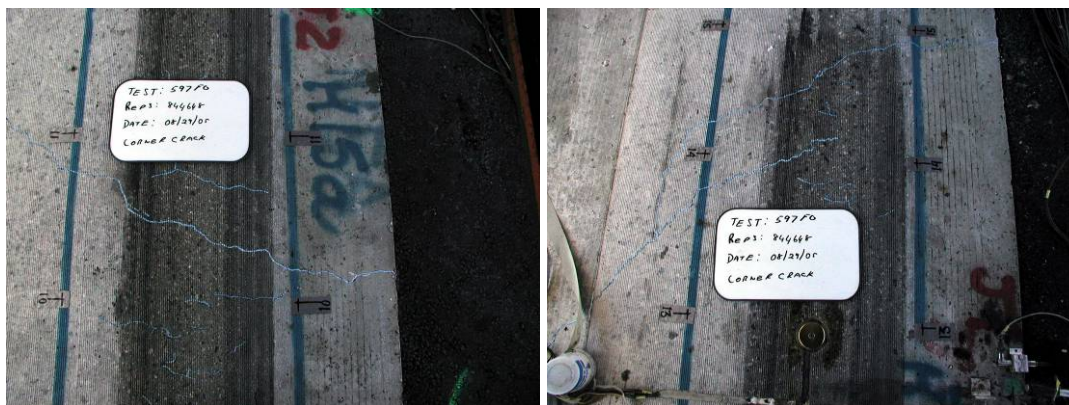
Fully developed corner cracks at one of transverse joints of Section 1, when loaded in dry pavement conditions
